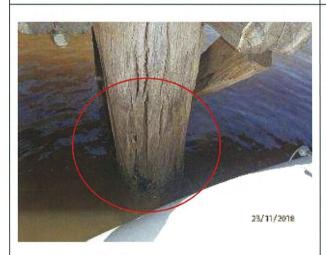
Extensive weathering and section loss evident to external surface of timber pile on pier 2.
